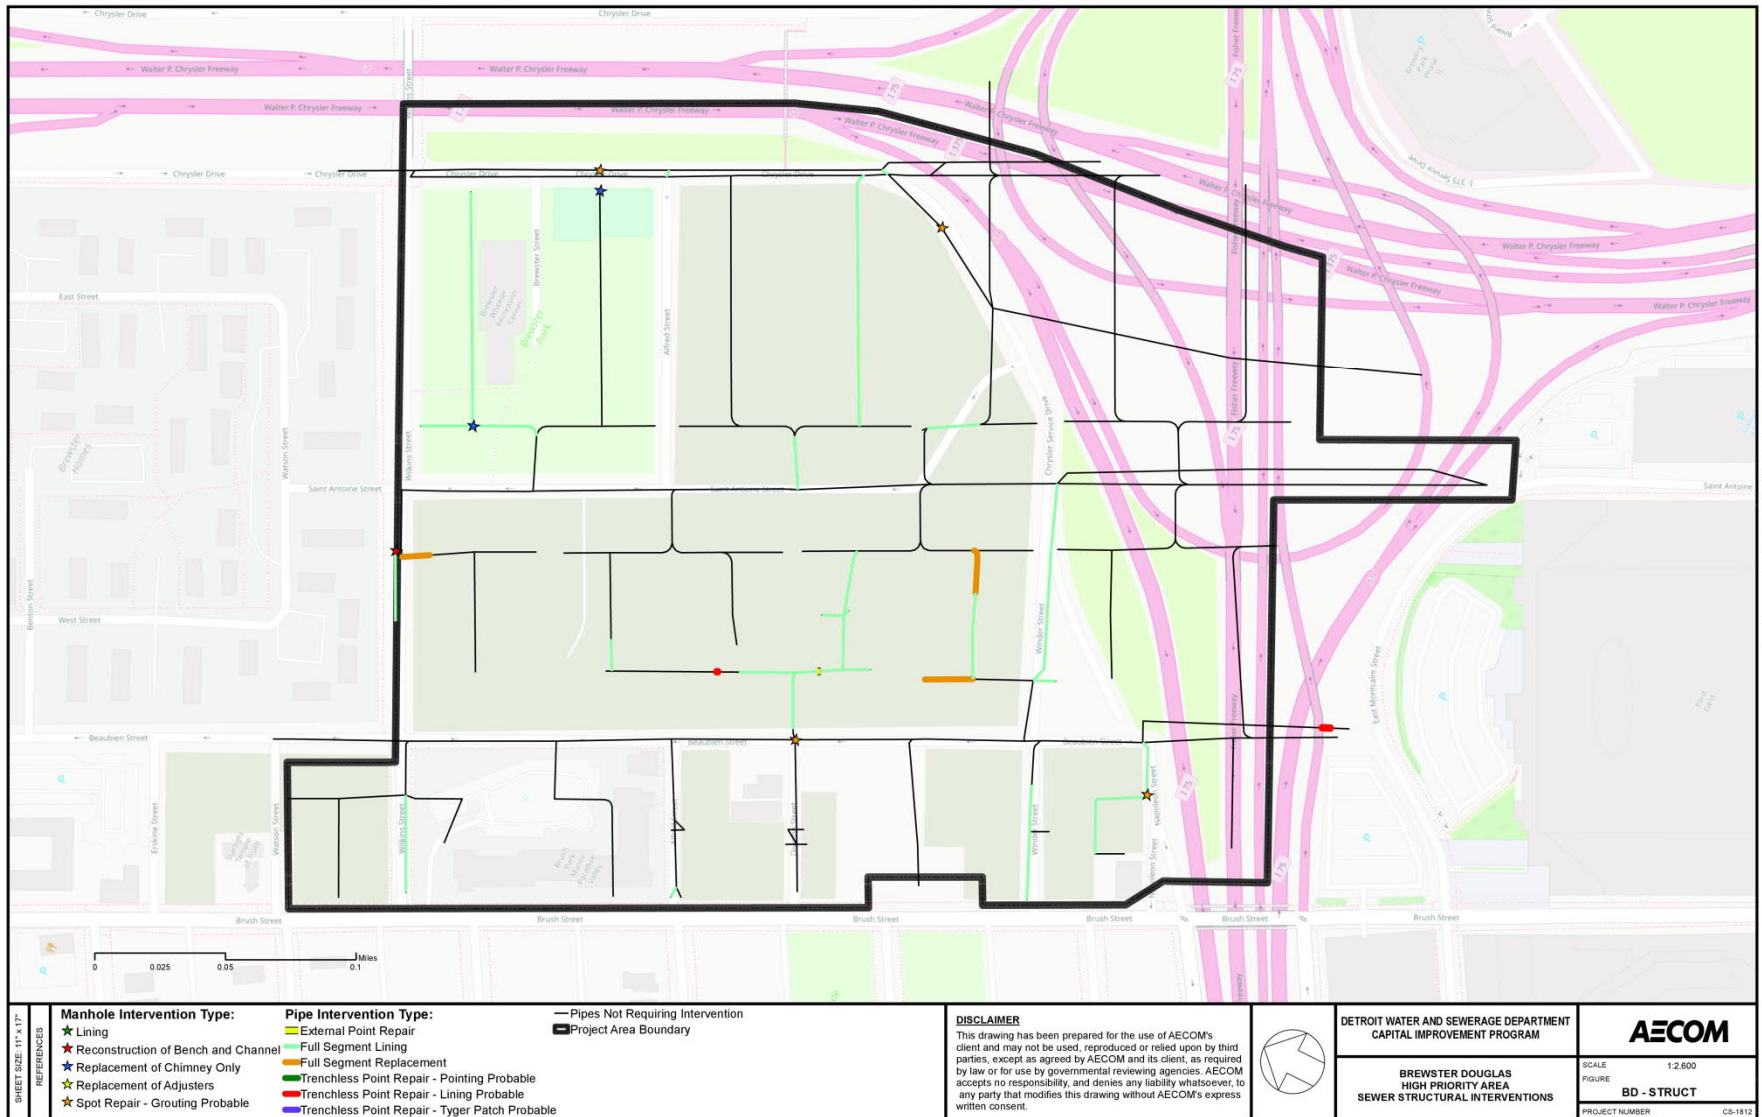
Brewster – Douglas Sewer Structural Repairs
